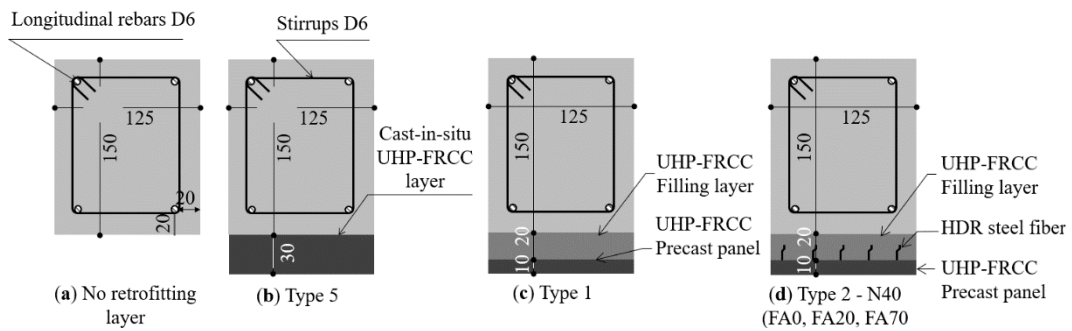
Specimen tested in Campaign 2: (a) RC beam without the retrofitting layer; (b) RC beam with a strengthening layer cast-in-situ on the lower surface of beam; (c) RC beam strengthened with precast panel without HDR fibres on the upper face, fastened to the beam by means of screws, dowels and filler layer; (d) RC beam retrofitted with a precast panel with HDR fibres on the upper face (spaced 40 mm), fastened to the beam by means of screws, dowels and filling layer.
